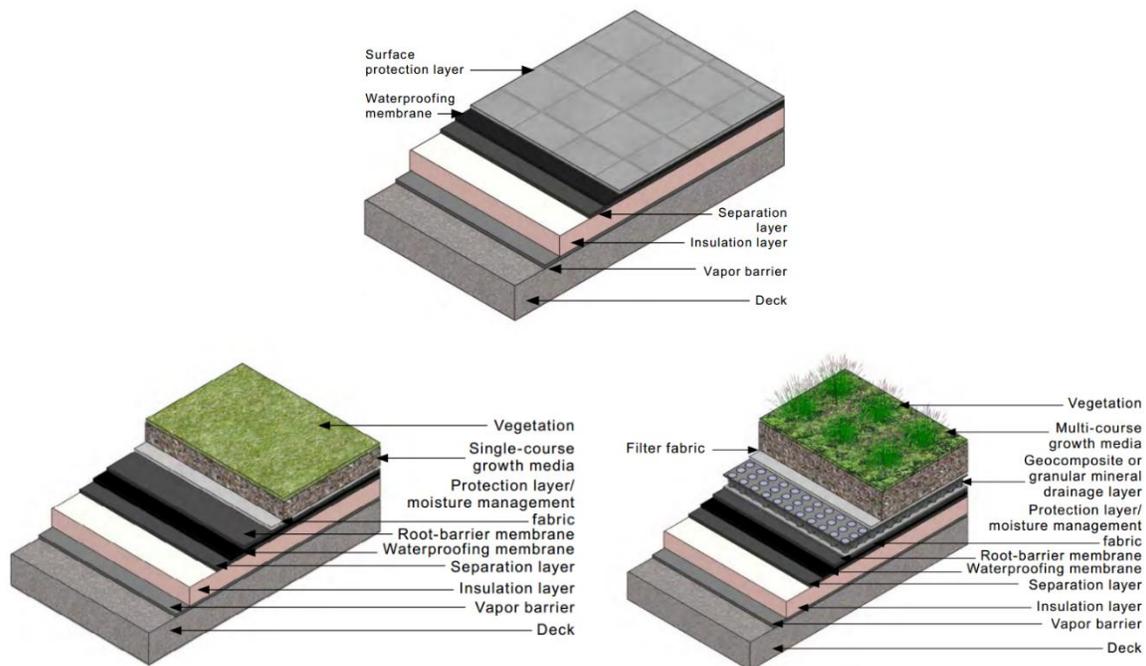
Examples of a conventional roof structure (top), green roof structure without a drainage layer (bottom left), and green roofs structure with a drainage layer (bottom right)¹²⁹
